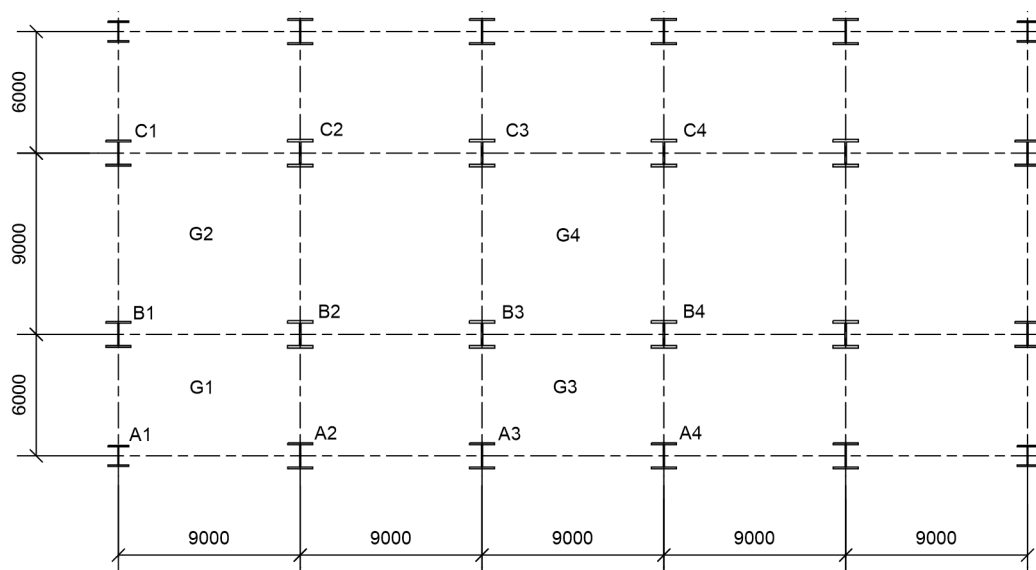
Structural plan arrangement of the steel frame (unit: mm)
